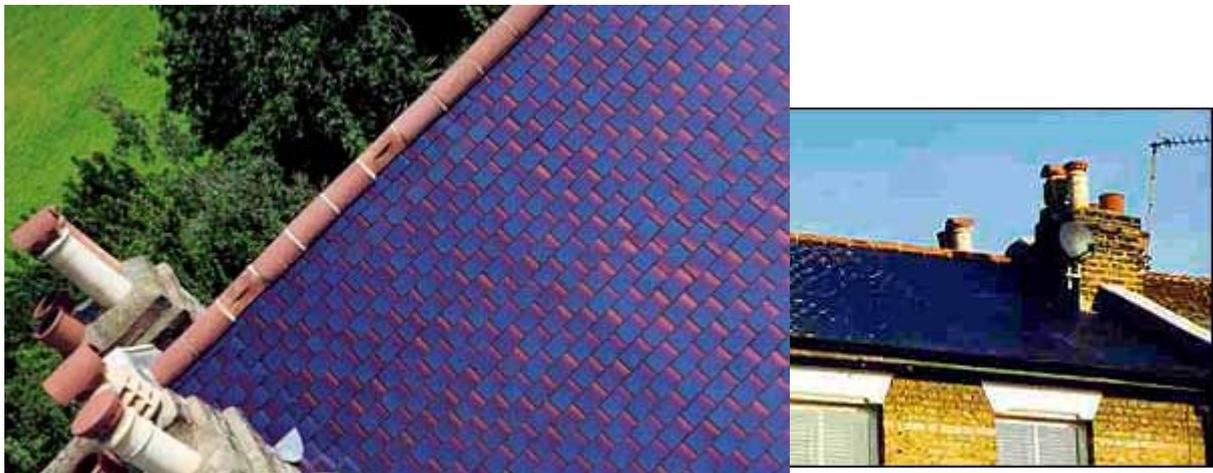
Example of a PV roof cladding which mimics roof slates (solar shingles based on ASI-2J) on a house in Richmond (Solar Century)
